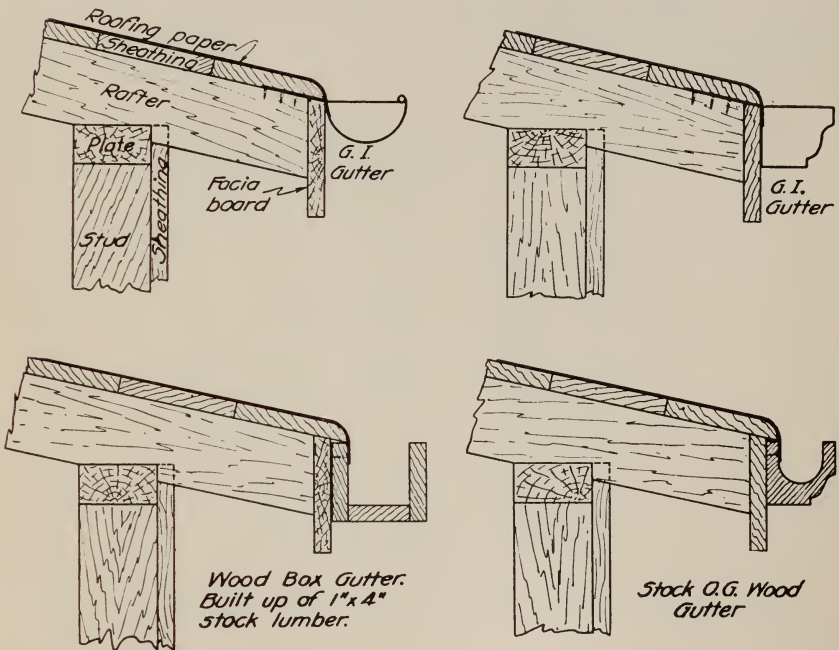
Different styles of gutters and how to install them on a shed roof poultry house.
